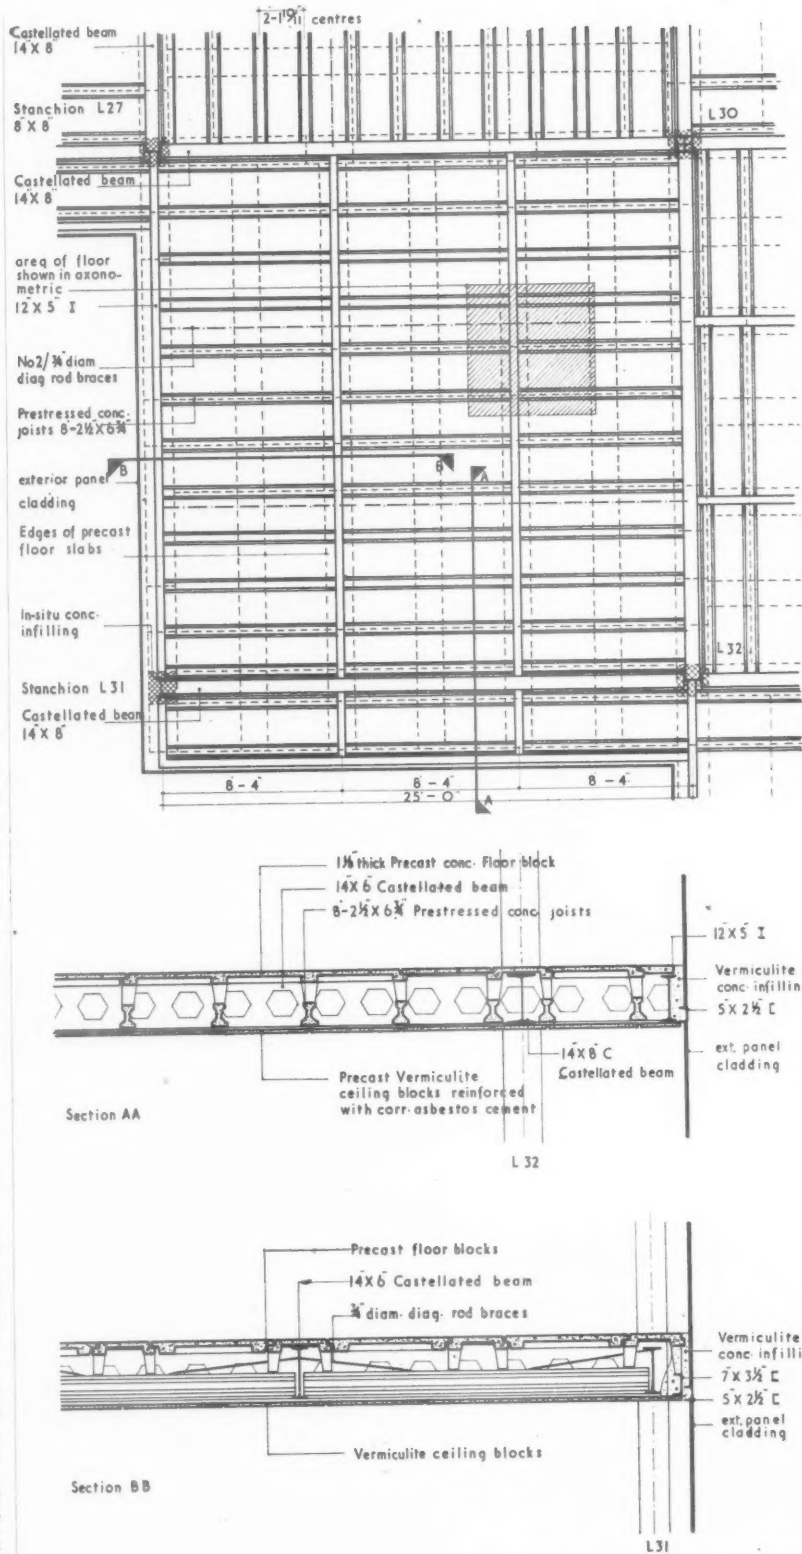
Classroom wing upper floor construction (laboratory wing floors employ the same system). The main requirements were: uninterrupted ceiling surfaces to allow for changes in the internal partition arrangement; fire protection of the steelwork; space in the floor for services (including drainage in the laboratory wing), and accessibility to this space for repair or for re-arrangement of the services in the event of re-planning of the rooms and equipment. The intermediate steel beams in the classroom bays go in alternate directions on successive floors to maintain even-stanchion loading. See also Fig. 3 opposite.
